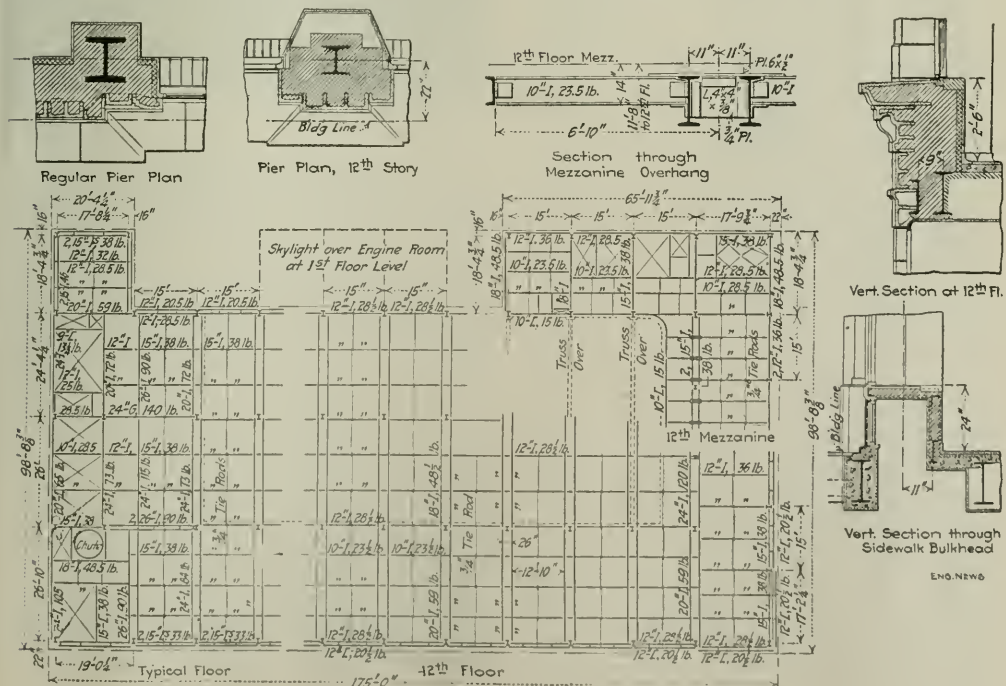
FLOOR FRAMING OF THE HILL BUILDING
